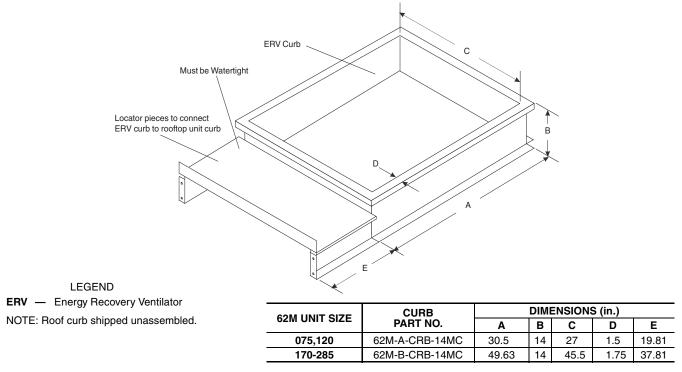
Roof Curb — 62M075-285 Units 3 to  $12^{1}/_{2}$  Ton Rooftop Units
